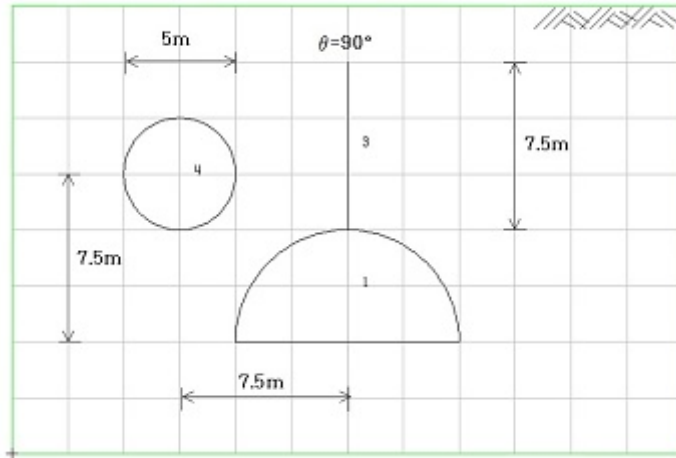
Arch tunnel with utility tunnel (Part 3)
